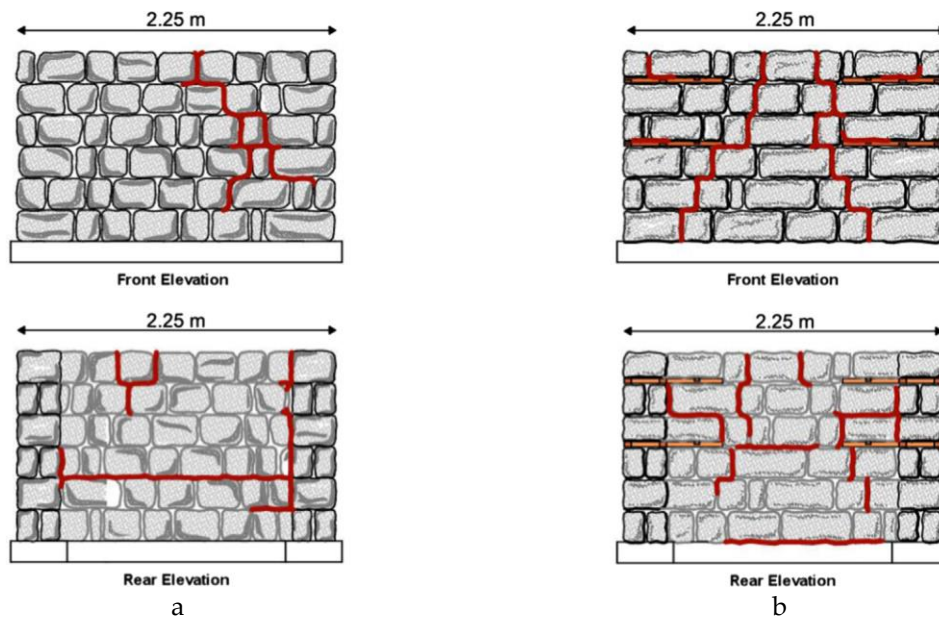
Experimental crack patterns in - (a) Unreinforced masonry, and (b) Timber-reinforced masonry from [96]
